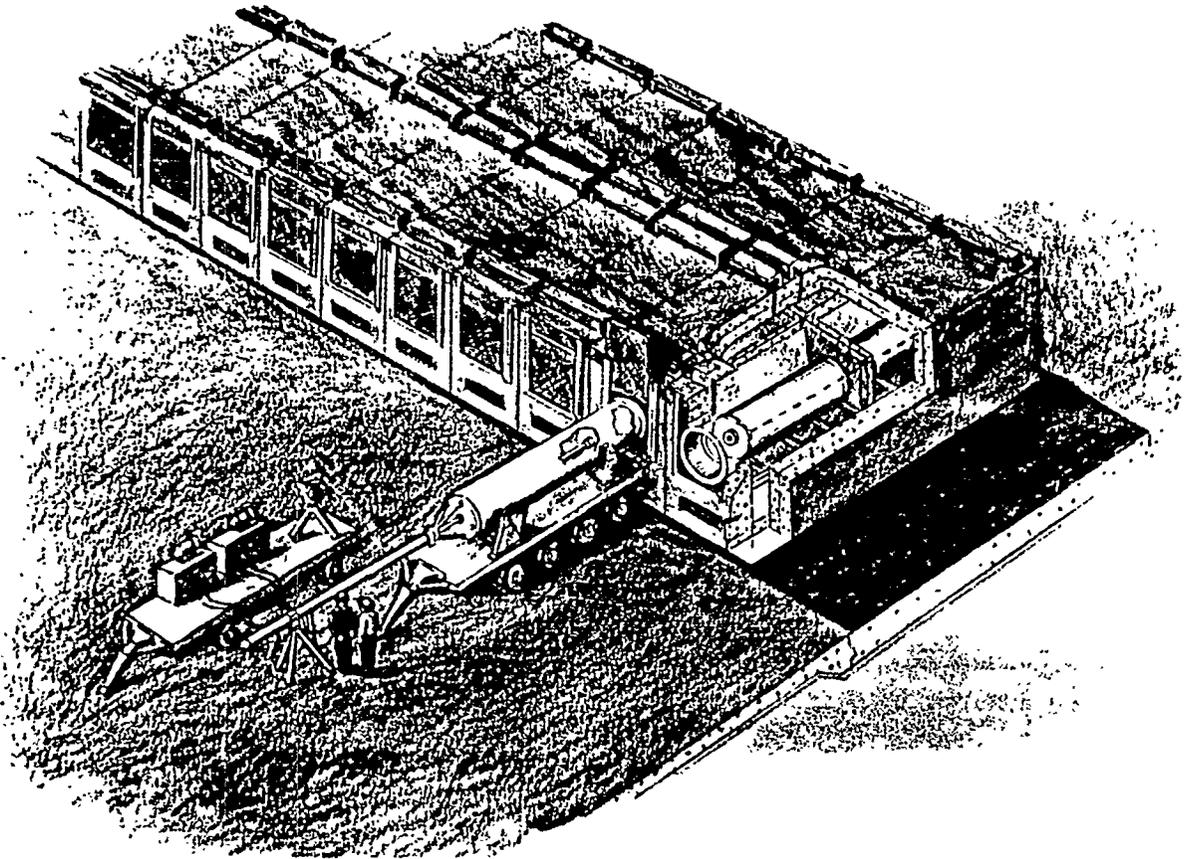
An artist's conception of spent-fuel storage in multiple-element sealed canisters inside a concrete module.
